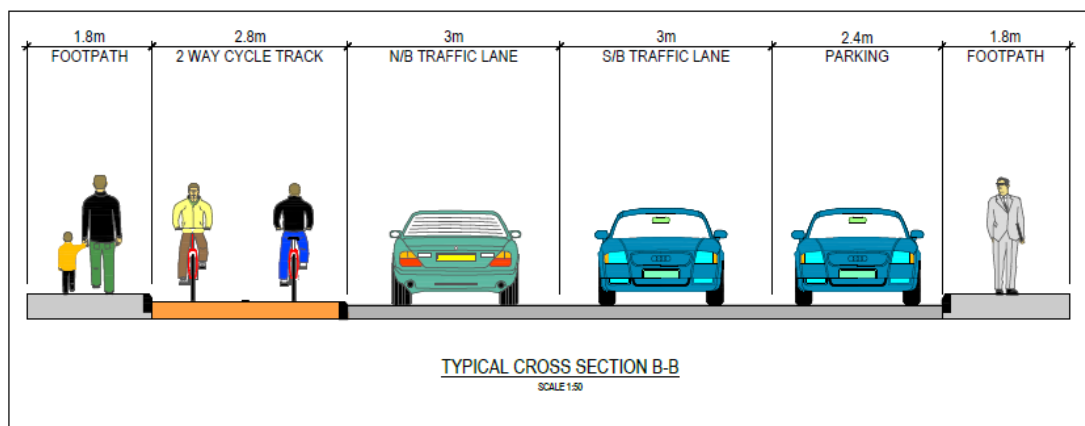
Cross Section for Proposals on Deansgrange Road outside Local Shops Area
